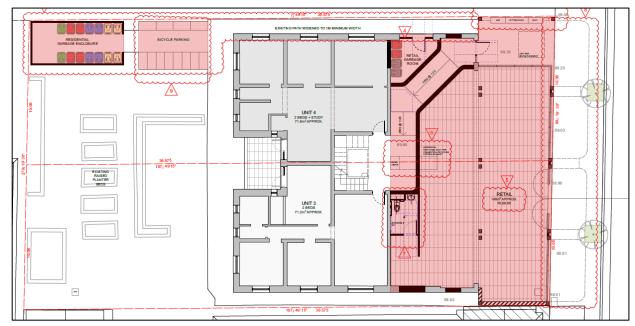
Approved Ground Floor Plan under DA-223/2021. (Source: SHED, 2021)
